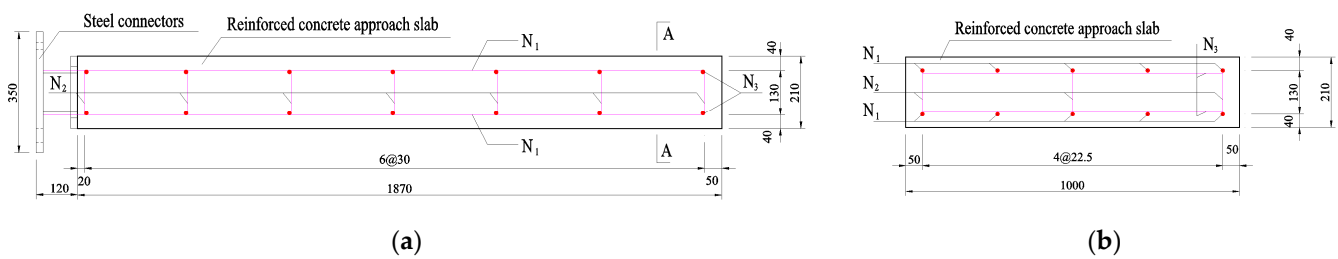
Dimension and rebar arrangement of FAS specimen (Unit: mm): (a) Longitudinal cross-section; (b) Section A-A.
